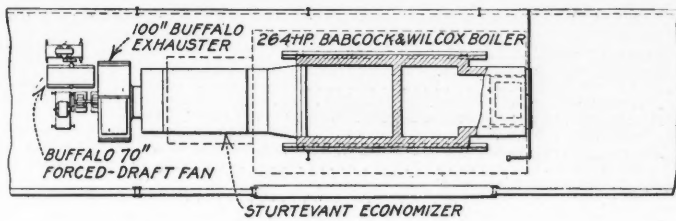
1912 ARRANGEMENT OF BABCOCK & WILCOX BOILER
